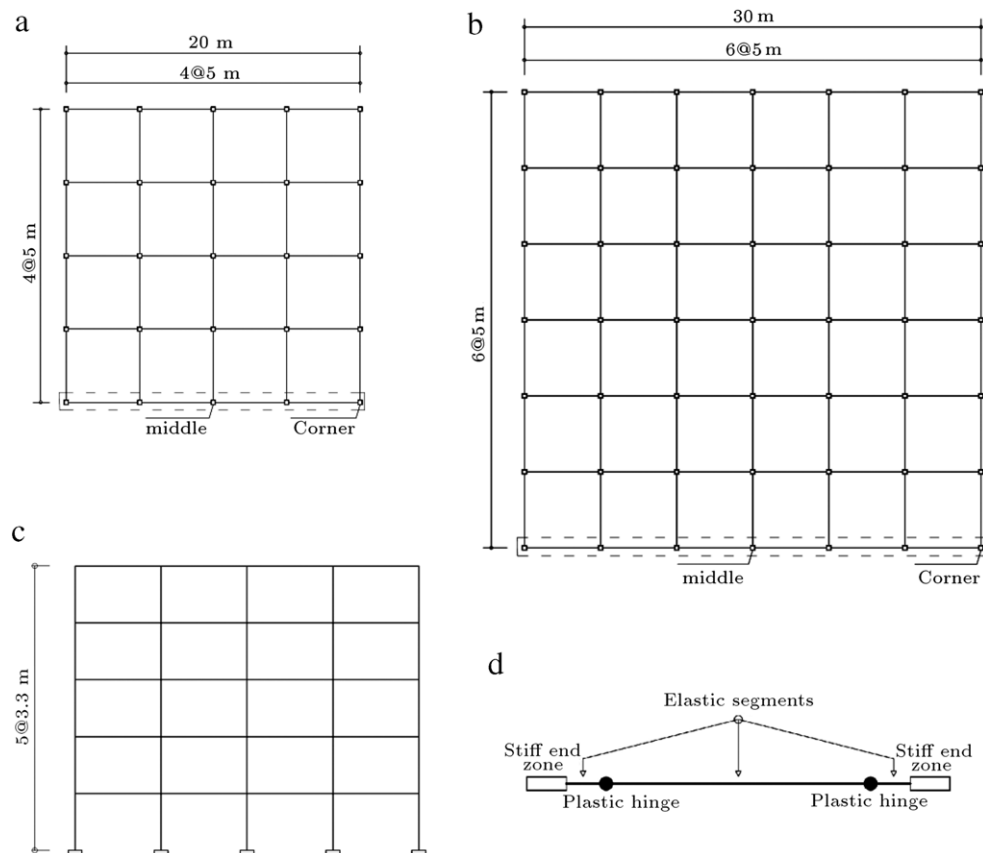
Model structures. (a) Structural plan of 4-bay structure; (b) structural plan of 6-bay structure; (c) elevation of 5-story model structure; (d) beam element in model structure.
